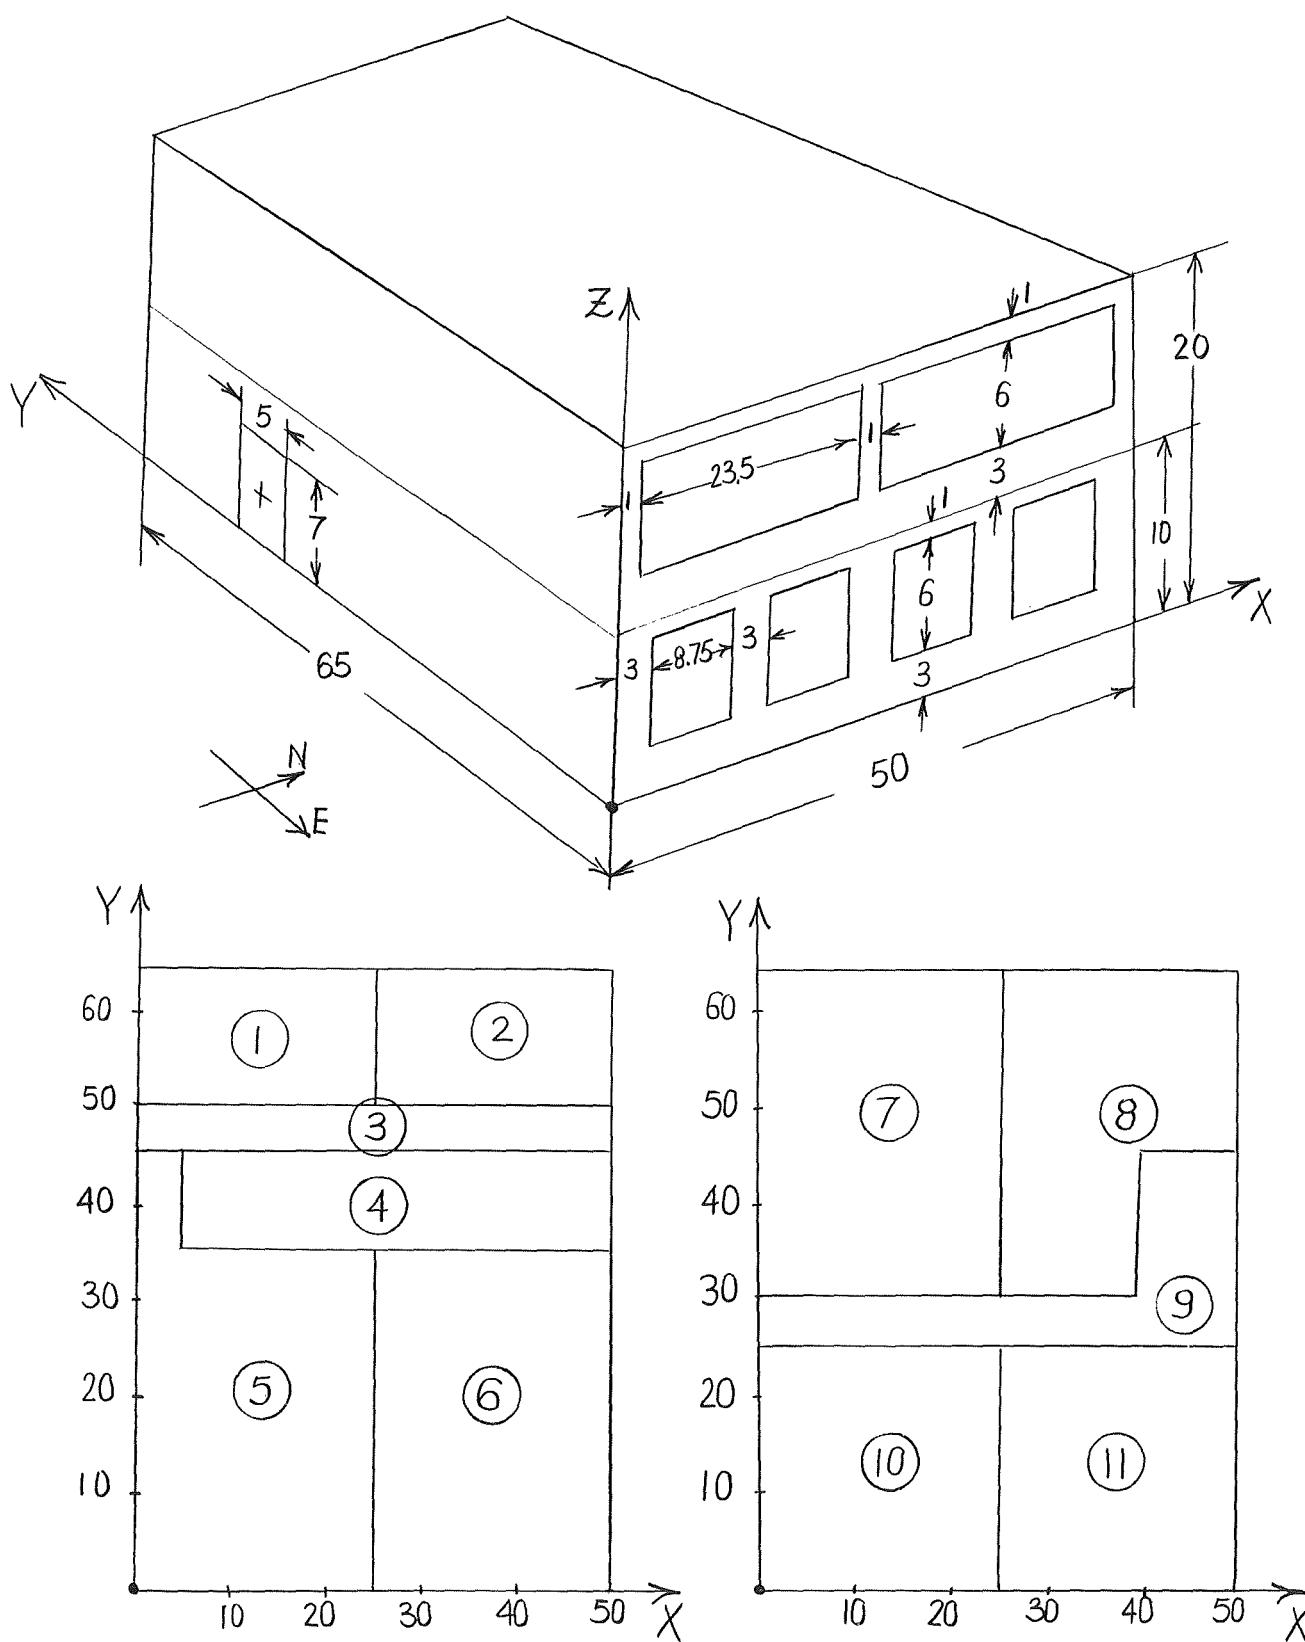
ISOMETRIC LINE SKETCH AND FLOOR PLANS OF EXAMPLE BUILDING WITH COORDINATE SYSTEM, MAIN DIMENSIONS AND SPACE NUMBERS
